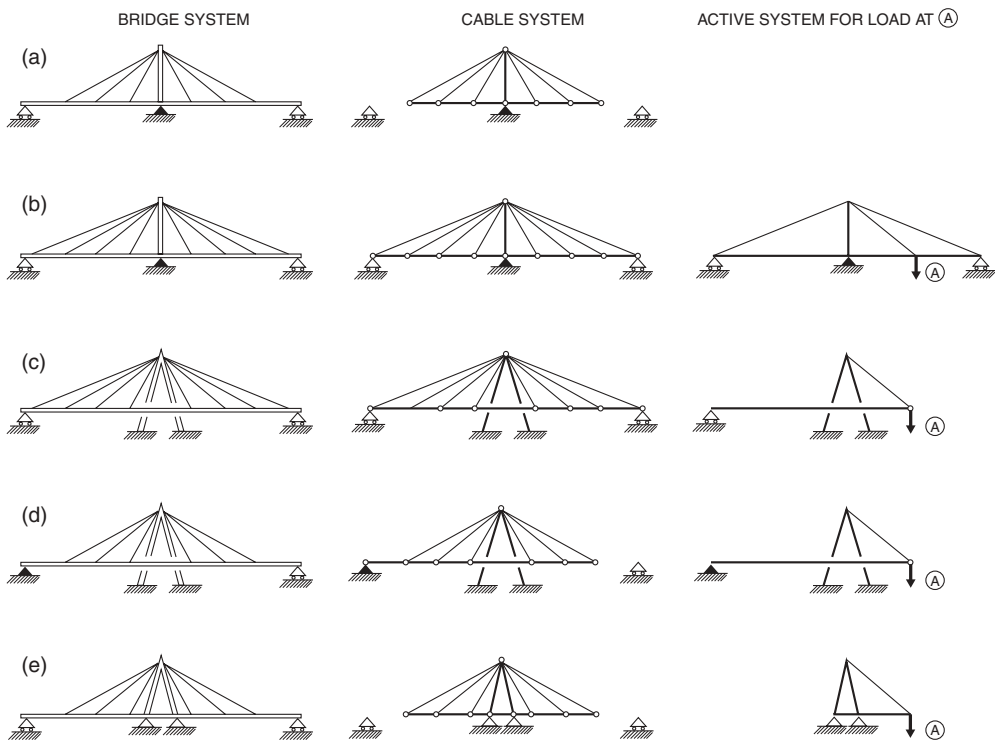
Structural systems of a symmetrical two-span cable stayed bridge
